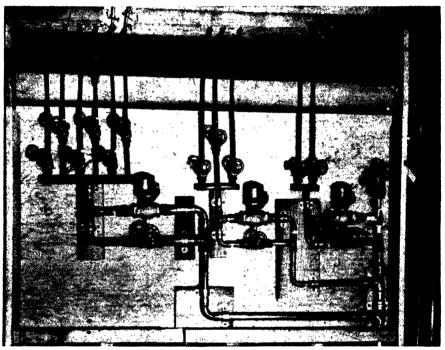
Zoning-valve assembly. (Courtesy of R. H. Allen, Allen Copper Coil Manufacturing.)
